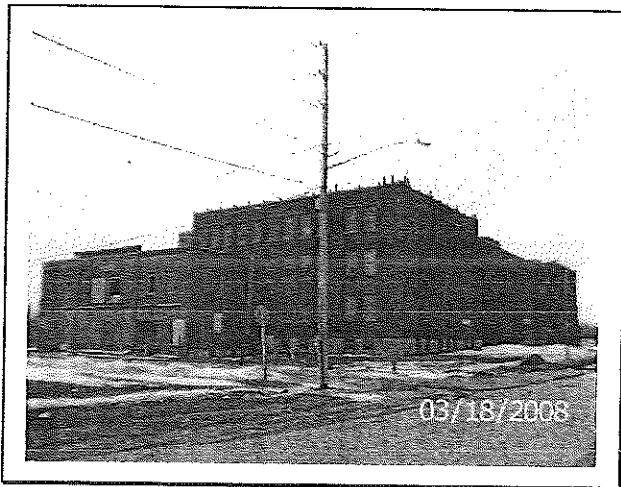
Viewing exterior of Rath Administration Building, looking Northeast.
